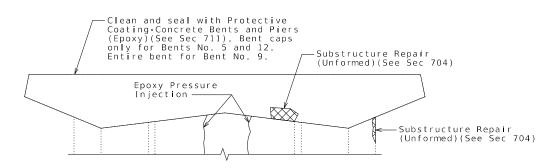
DETAIL SHOWING SUBSTRUCTURE REPAIR AT END BENT NO. 15
